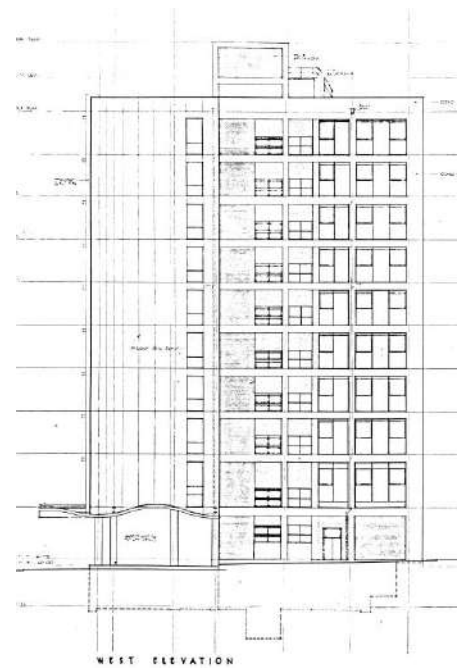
West elevation. Drawing date stamped February 1963 (BAP).
